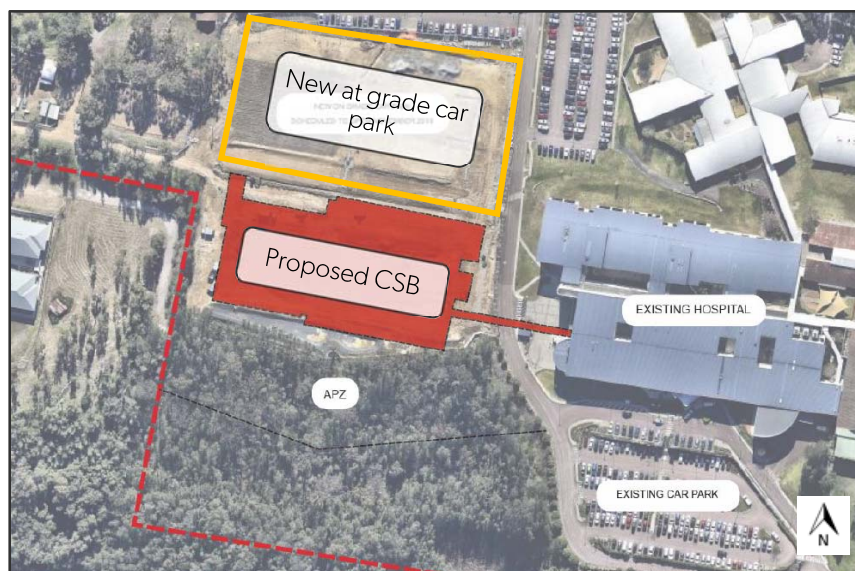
| New at grade car parking located north of the proposed CSB (Source: Applicant’s RtS)
